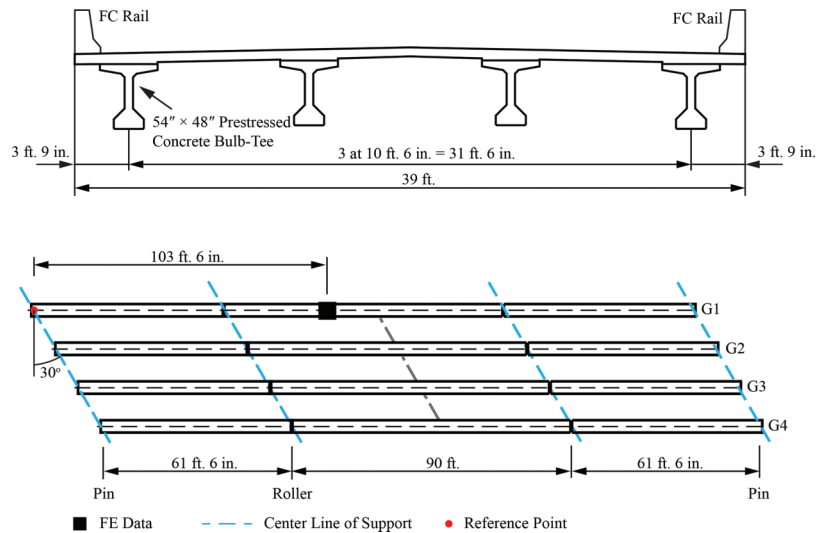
Cross-section and frame plan of the modified three-span continuous prestress girder bridge with 30-degree skew angle.
